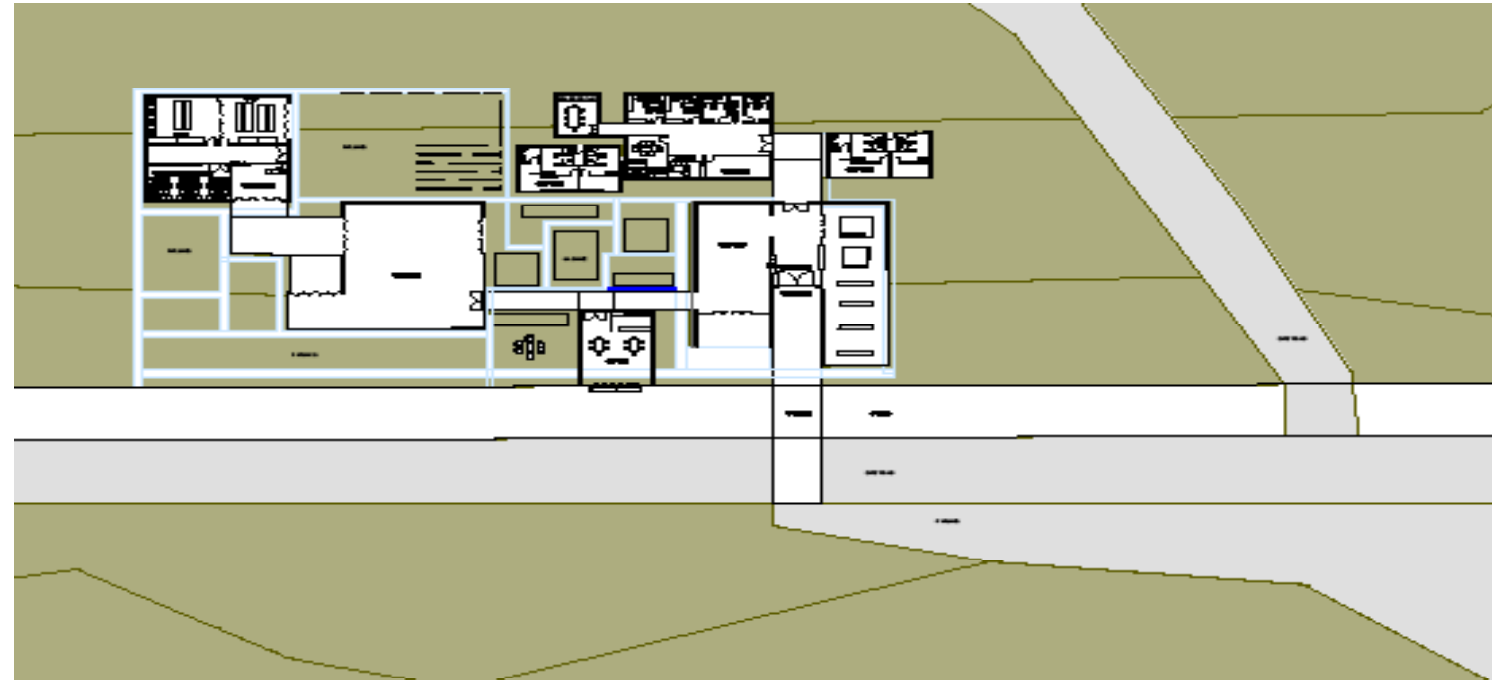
First developed floor plan next to the canal (Author, 2023).
